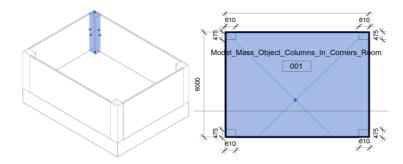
REVIT BIM MODEL WITH COLUMNS AS "IN-PLACE MASS" OBJECTS – LEFT: 3D VIEW. RIGHT: FLOOR PLAN VIEW
